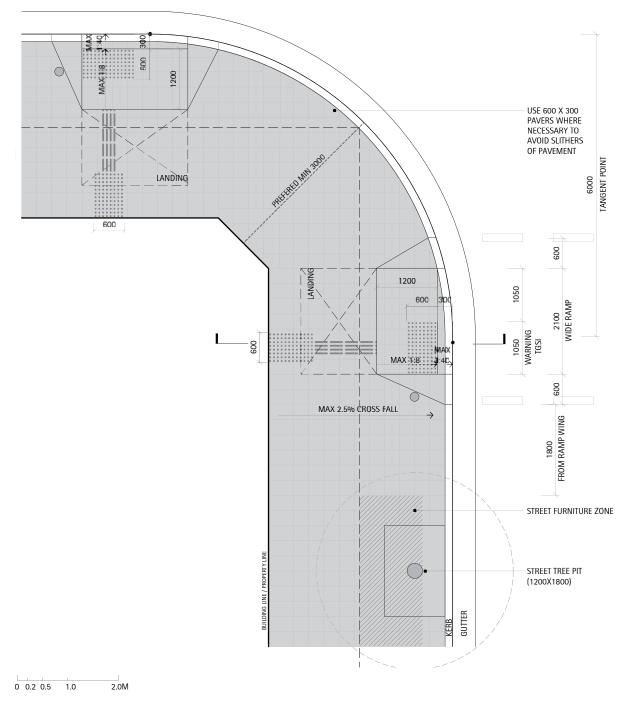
Streets Corner Plan: 6000 Radius 2100 Ramp
